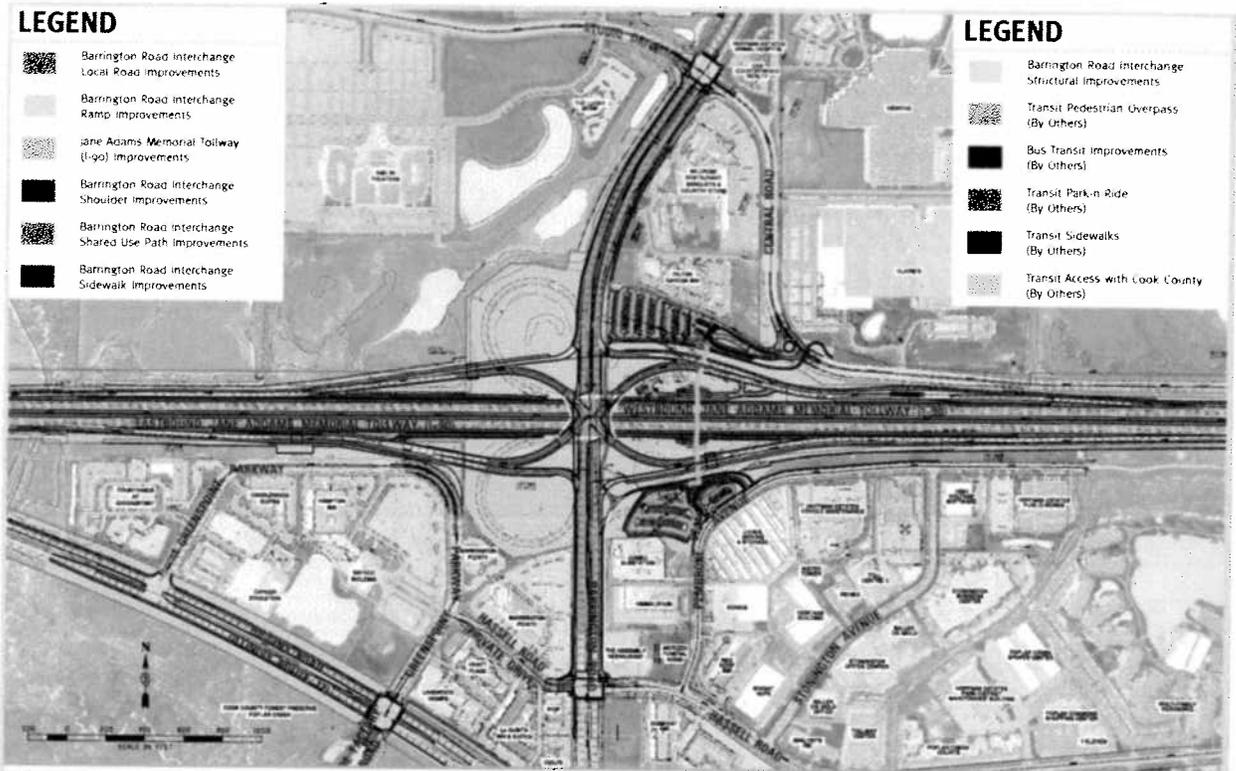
PROPOSED BARRINGTON ROAD STATION
